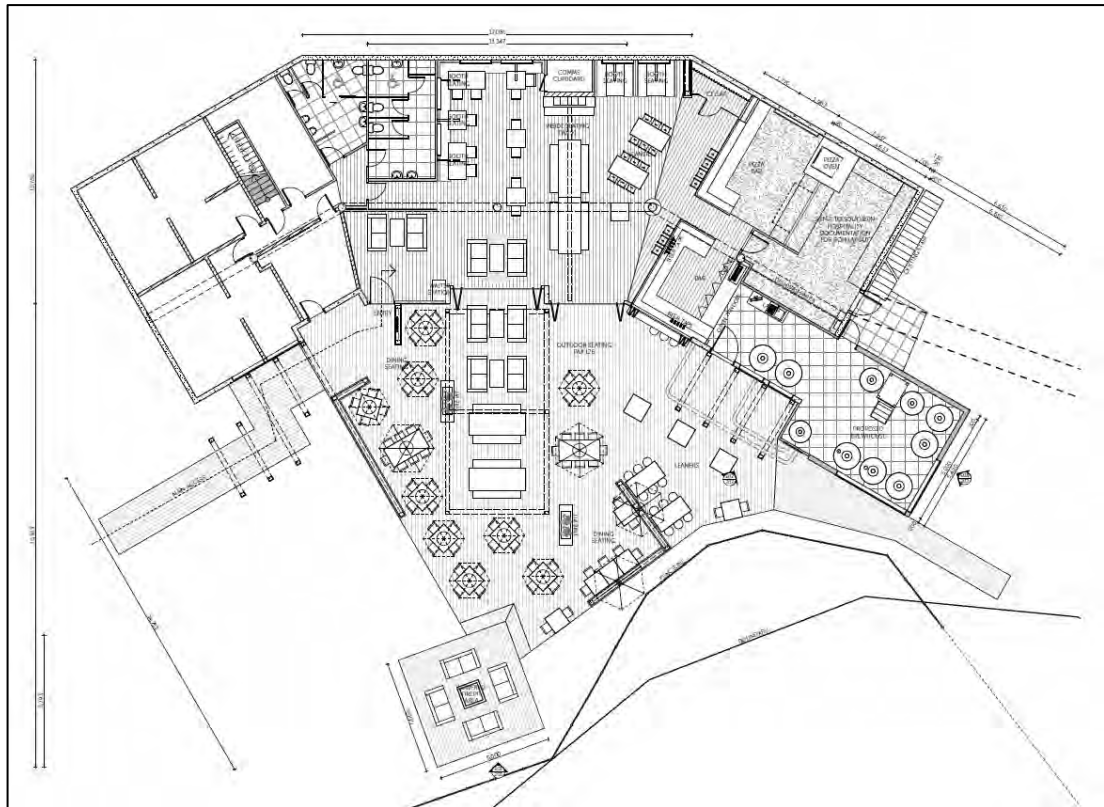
Proposed site plan showing deck area (Source: Element 17).
